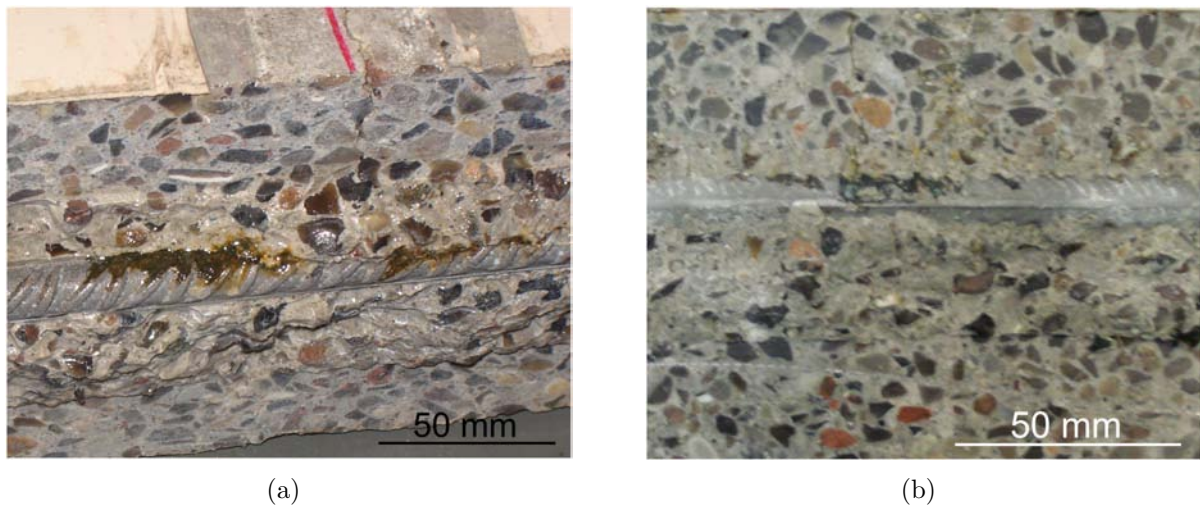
Images of corrosion product immediately after removal of cover concrete from (a) Beam 1, standard rebar and (b) Beam 6, instrumented rebar. (Author's photos)
